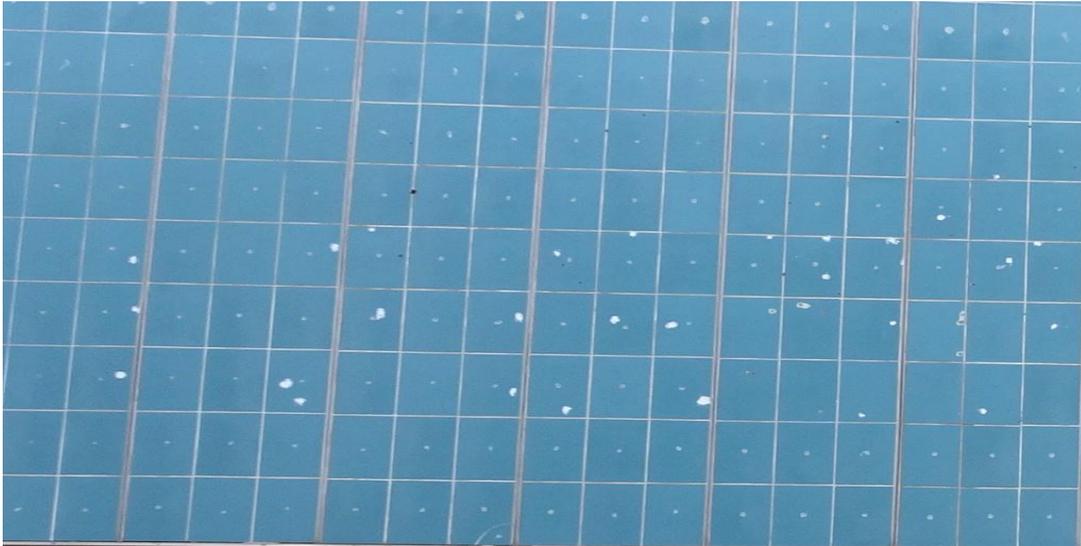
125 S Las Vegas Blvd, west façade, showing detail of screws and damage to the exterior blue tile
